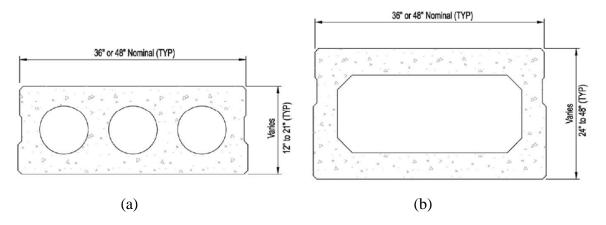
(a) Single Precast Prestressed Deck Slab Beam (FHWA, 2013a) (b) Single Precast Prestressed Box Beam (FHWA, 2013a)
